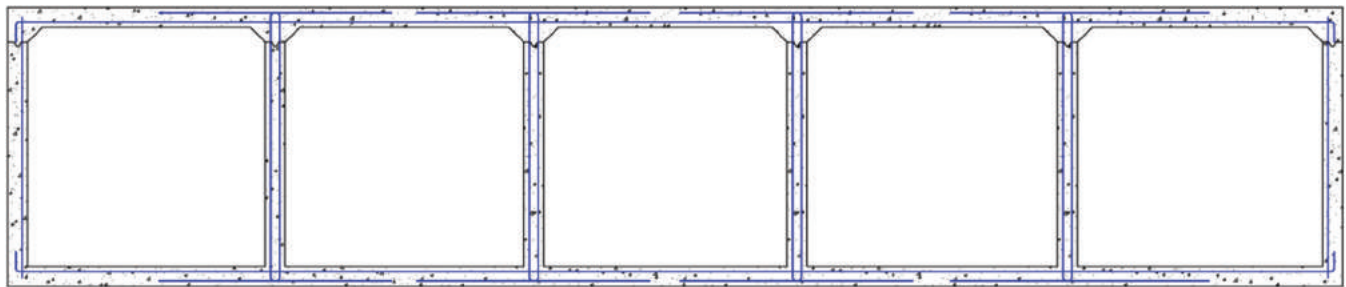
Detailed cross-section of the culvert design depicting a 5-cell box culvert.
